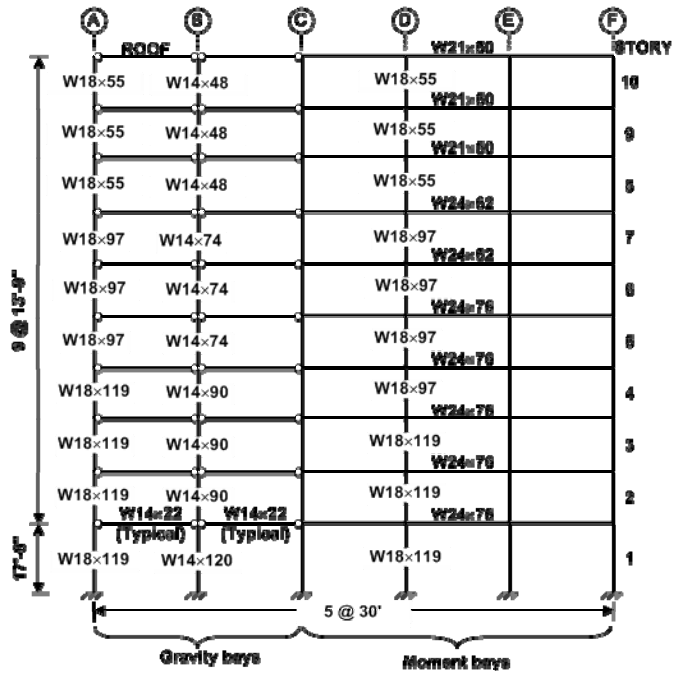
IMF Building Frame (SDC-C): E-W Elevation (Line 6)
